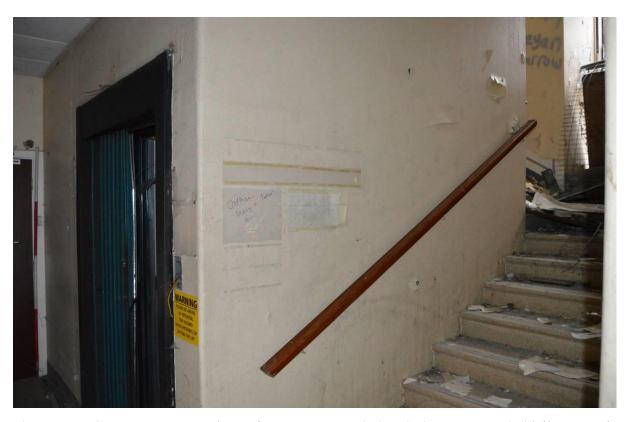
The Ann Canning Childs' Ward for Women stairs which, as built, encompassed a lift (facing west).
